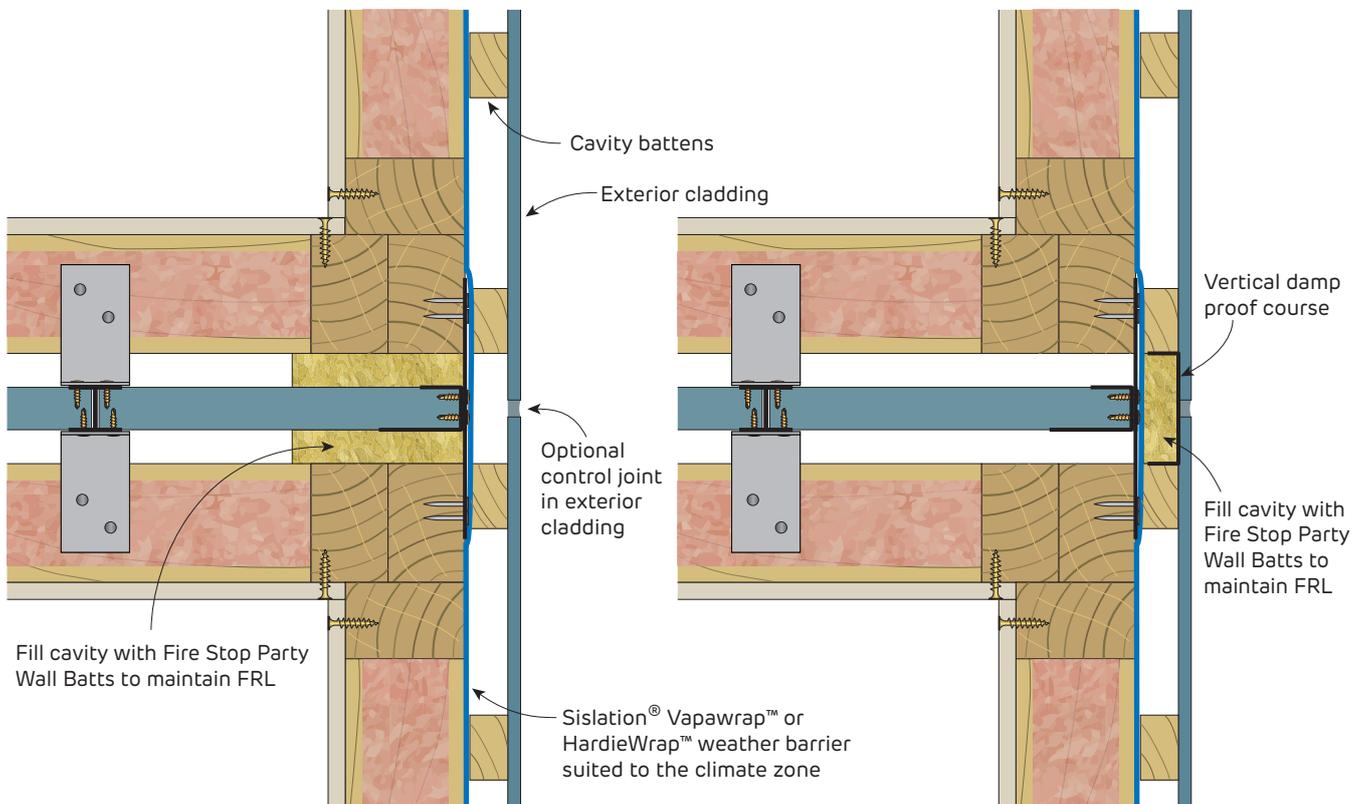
Interhome Wall to External Clad Wall with Cavity Batts
